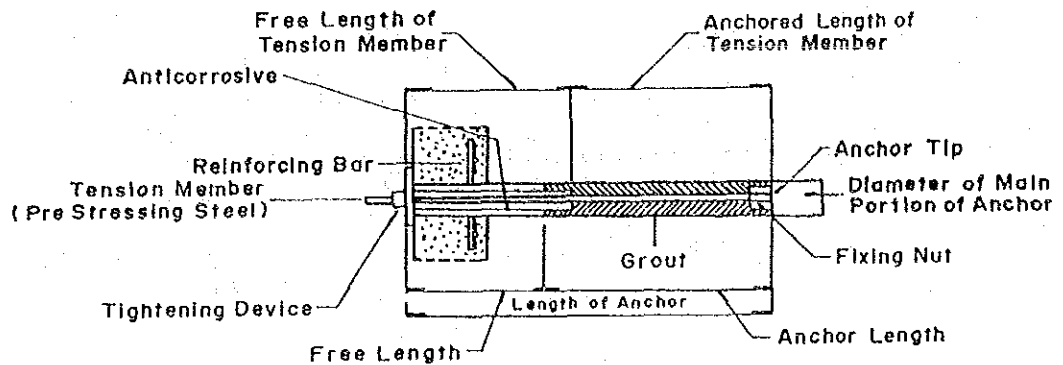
STRUCTURAL DETAIL OF ANCHORING MEMBER
